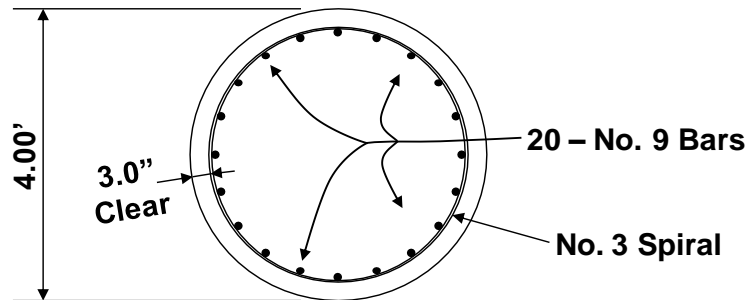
Assumed reinforcement layout of the drilled shafts
